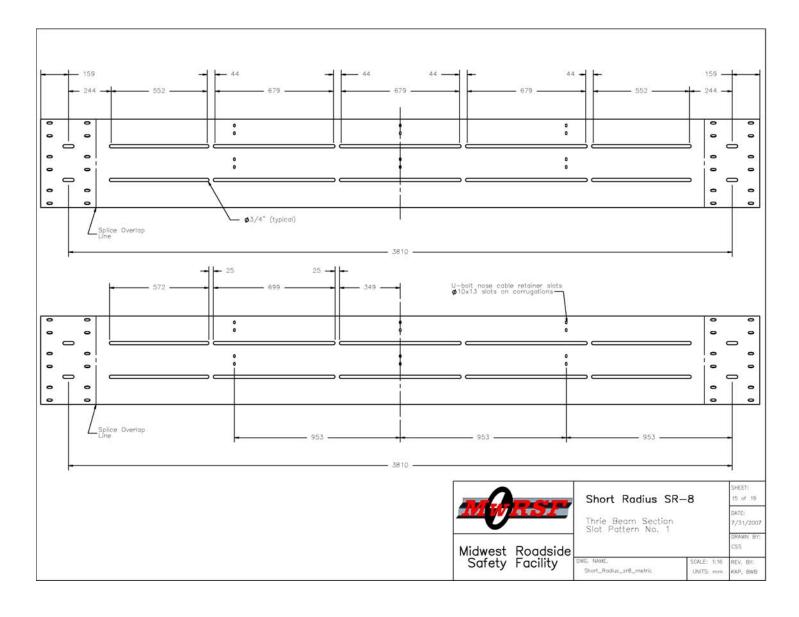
Thrie Beam Section Slot Pattern No. 1
